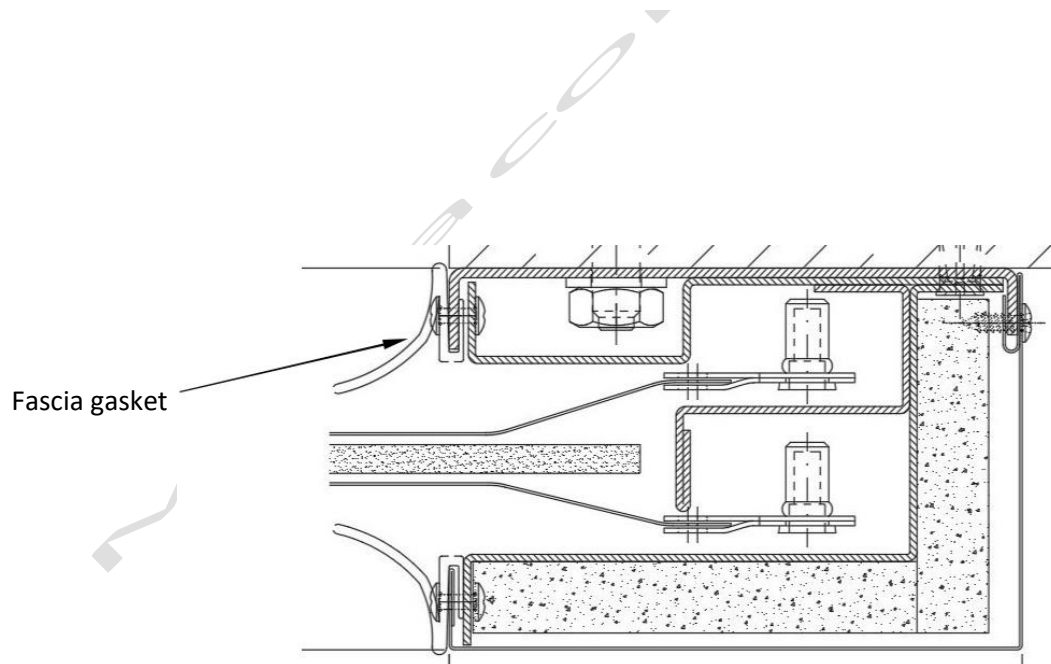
Cross-sectional view of a guide rail with the fascia gaskets secured with riveted clips
